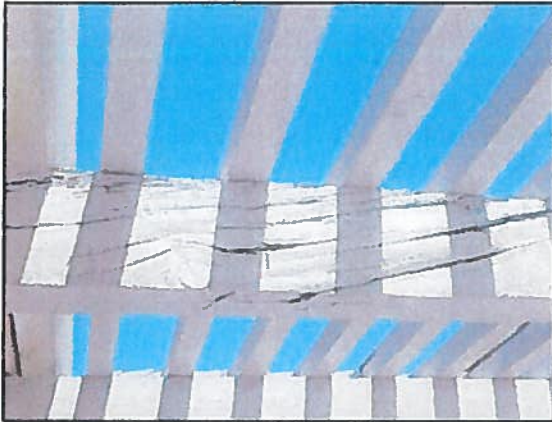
Fire Station 3 – Weathered and damaged area of patio overhang
